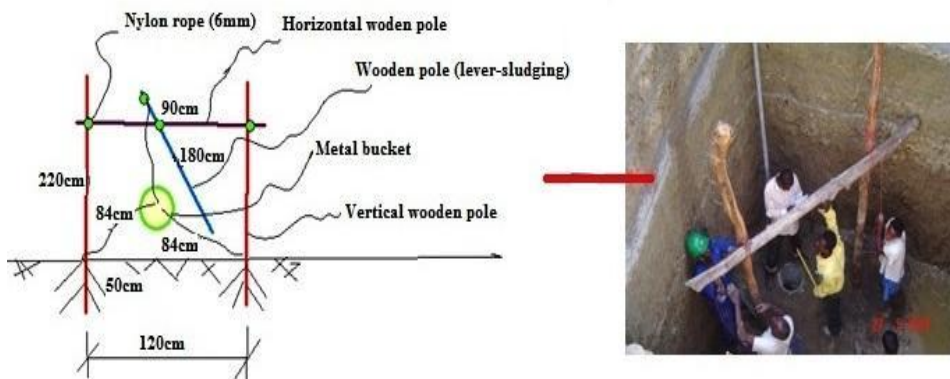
Fixing Drilling poles, Pipe with Simple Sludge
